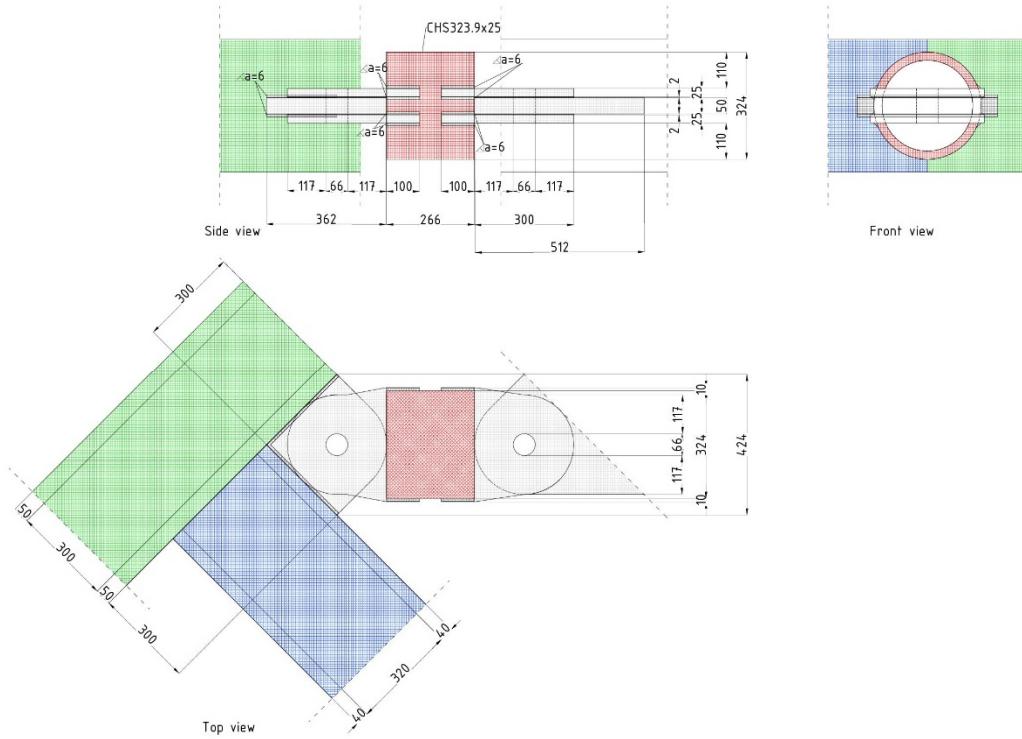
Horizontal diagonal brace to stability beam and horizontal X brace connection
